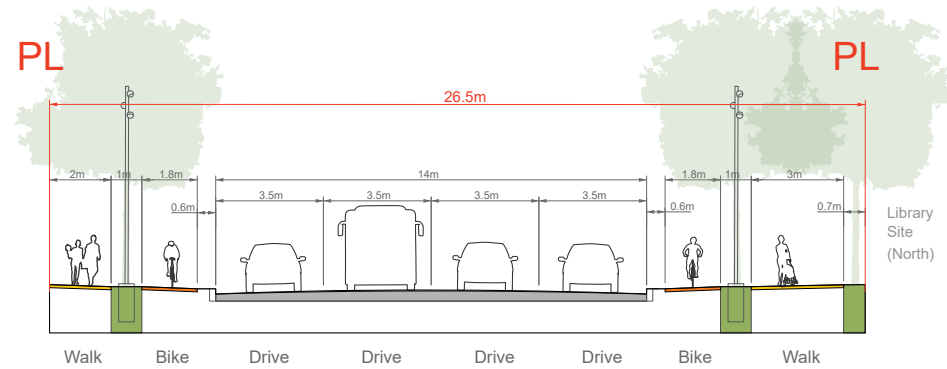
| Planned improvement to Albert Street, east of Empress (26.5 m)
